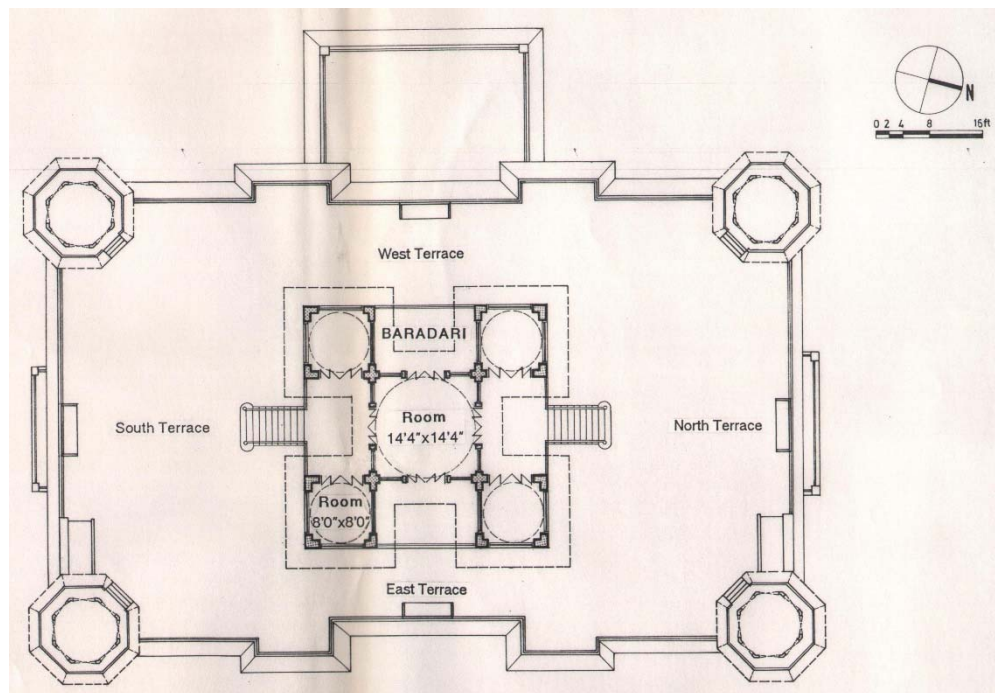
Second Floor Plan of Mohatta Palace. Courtesy to Copyright © 2016 Heritage Foundation of Pakistan
